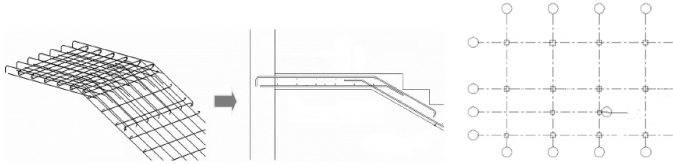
The schematic diagram of stair reinforcement and the construction drawing of some column members
